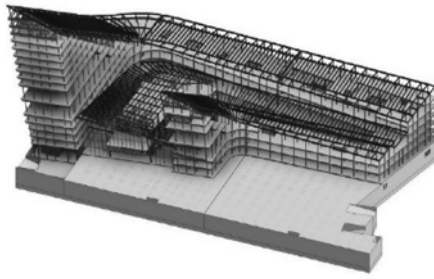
General layout of the load-carrying structure of the multifunctional building.
